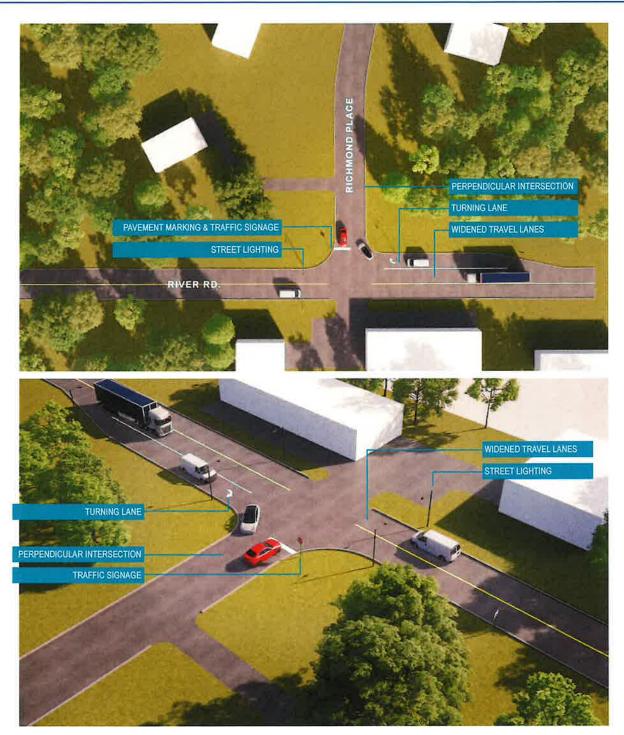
River Road proposed conditions, plan view & axonimetric view above, Proposed improvements to include:
